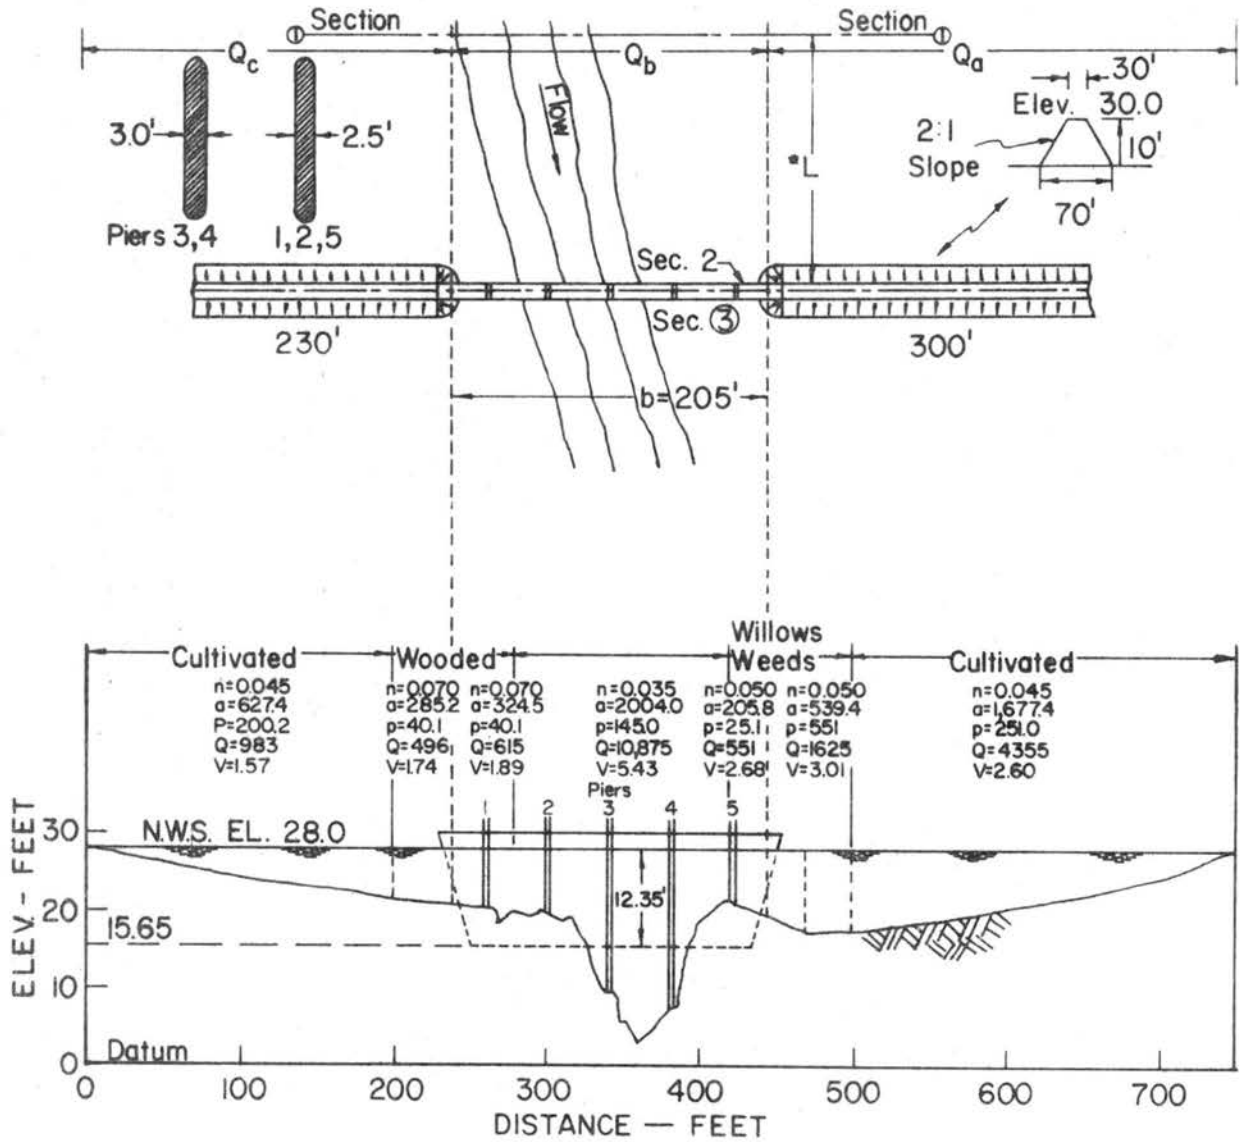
Plan and Cross Section of Example Crossing, from Bradley (14)
